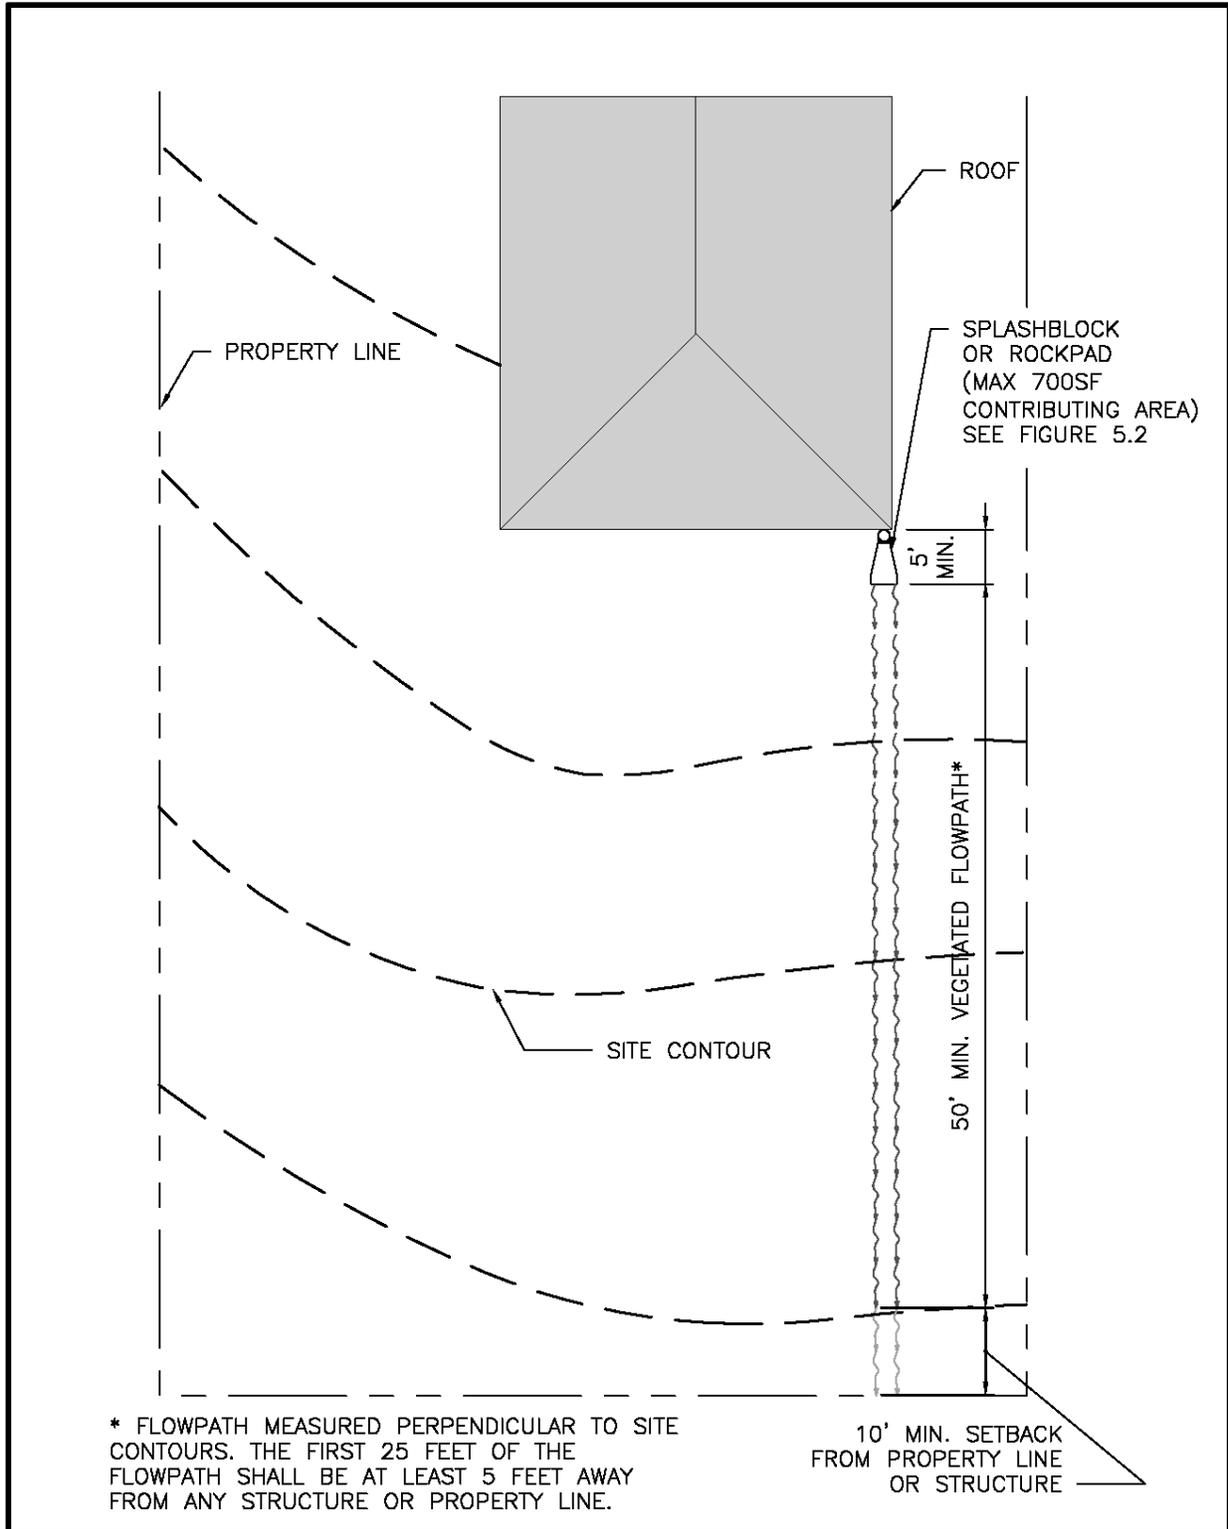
Typical Downspout Splashblock and Dispersion Trench Plan.
